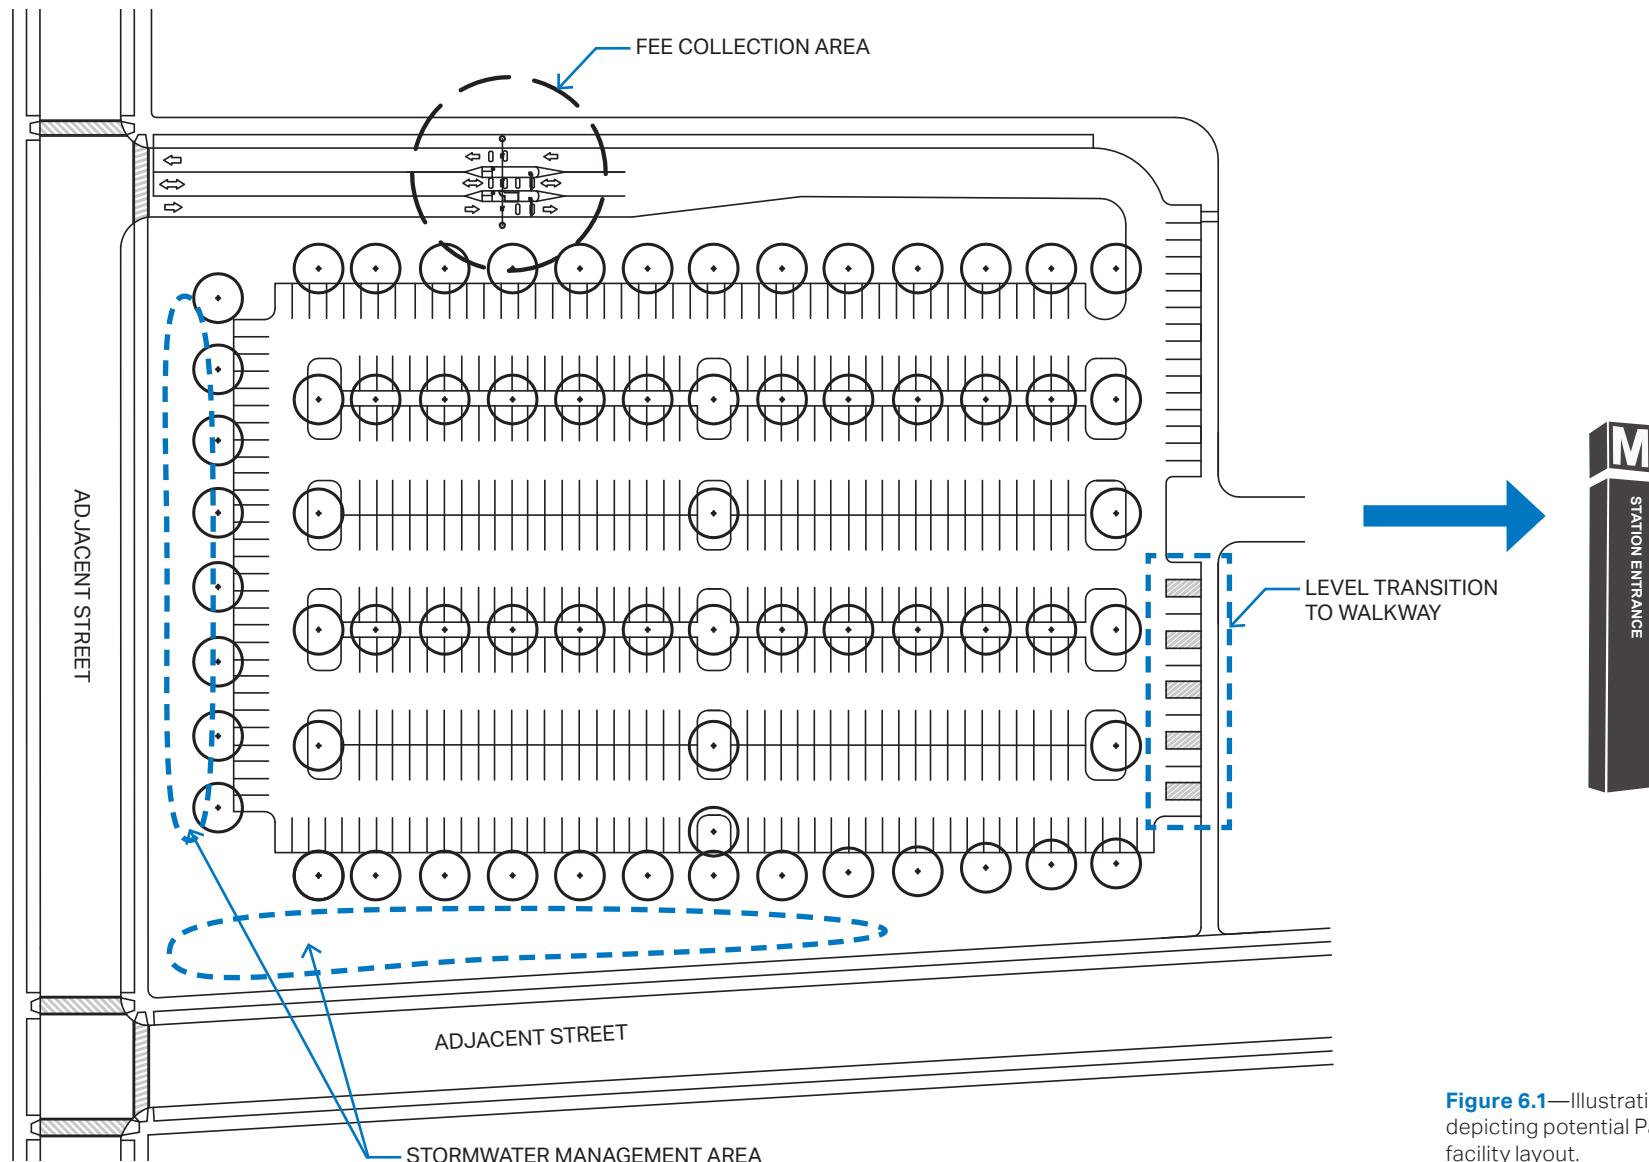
Illustration depicting potential Park & Ride facility layout.
